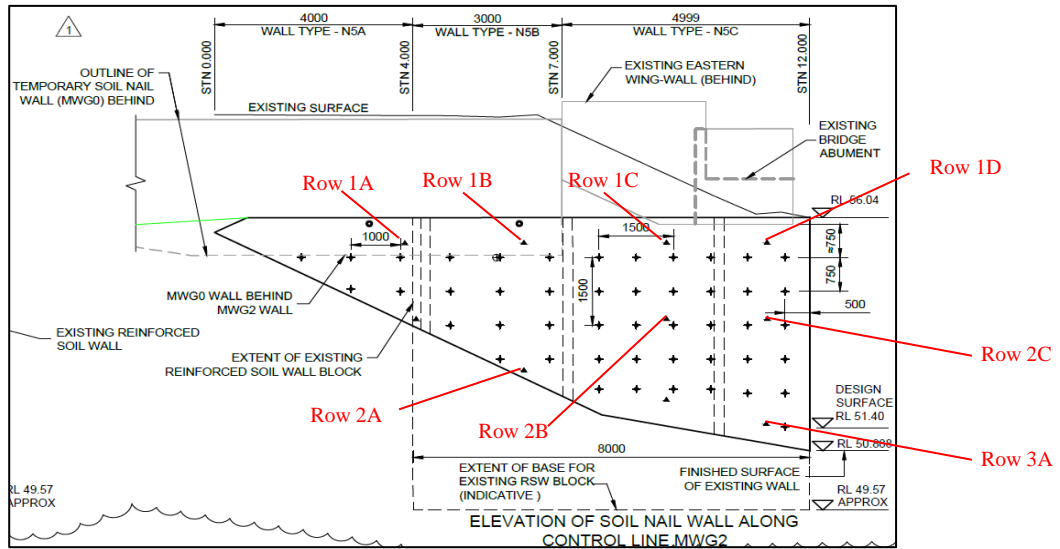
Survey markers at wall excavation across RSW at the southern abutment
